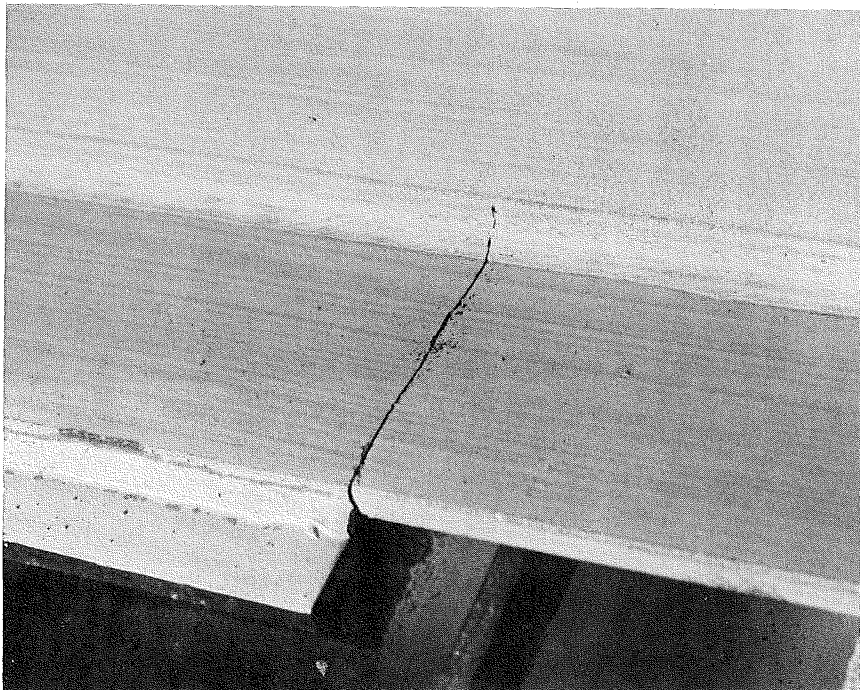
Typical Plain-Welded Beam Failure
